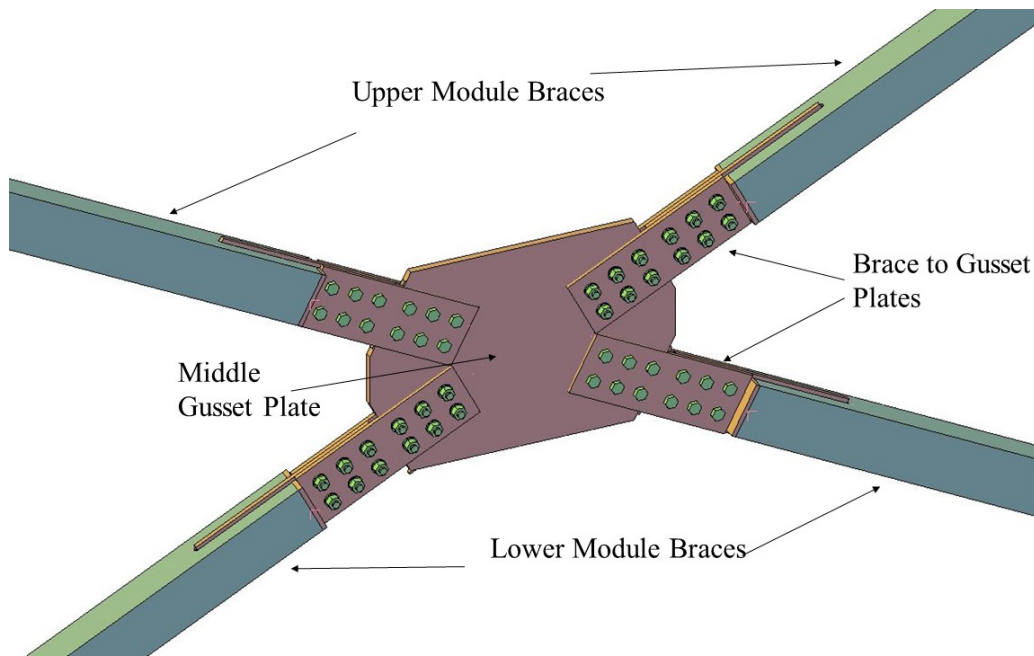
Middle gusset plate connection (after the assembly of the top module)
